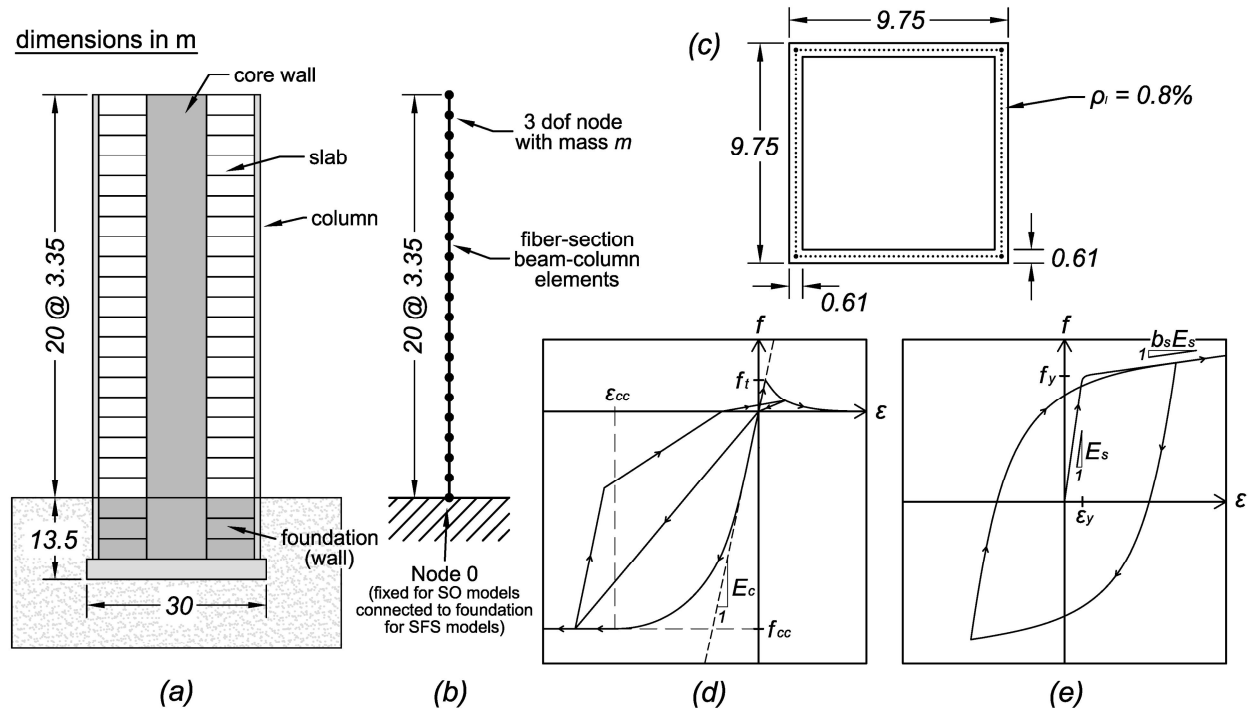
(a) Elevation view of the 20-story core wall building considered; (b) 2D model for superstructure; (c) cross-sectional details of the core wall; (d) concrete material stress-strain; and (e) steel material stress-strain.
